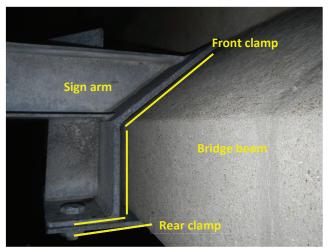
Attachment to bridge beam, saddle clamp, front view
